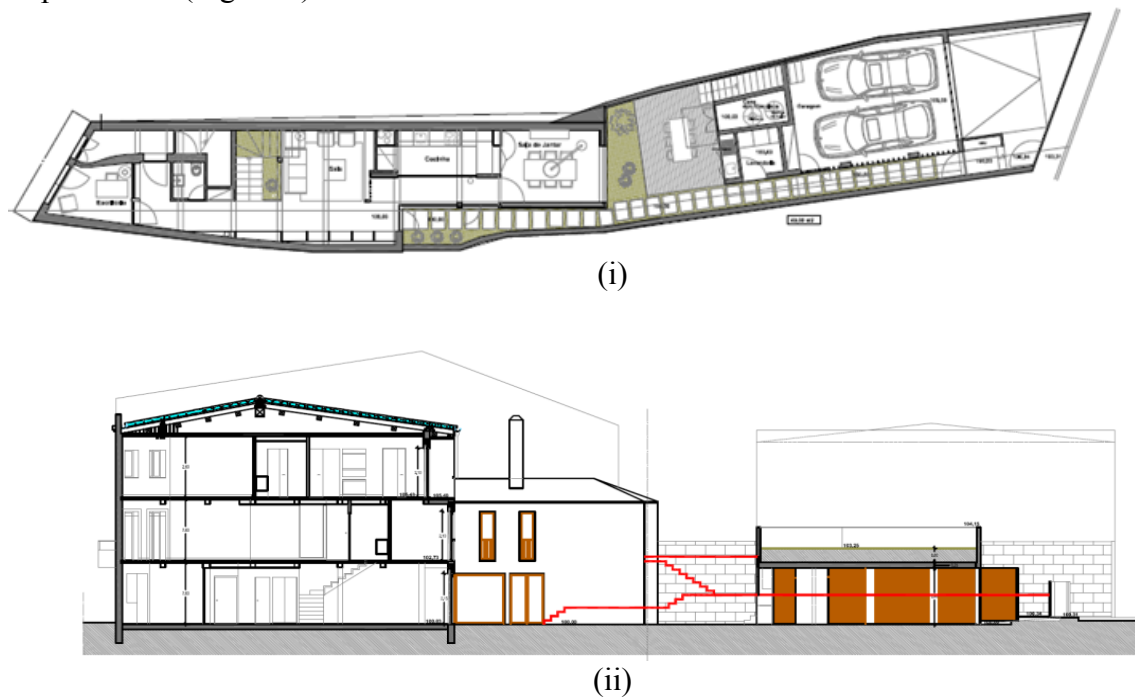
Ground floor plan of the rehabilitation project (i); Cross section of the building (the red line represents the existing levels of the terrain) (ii).
